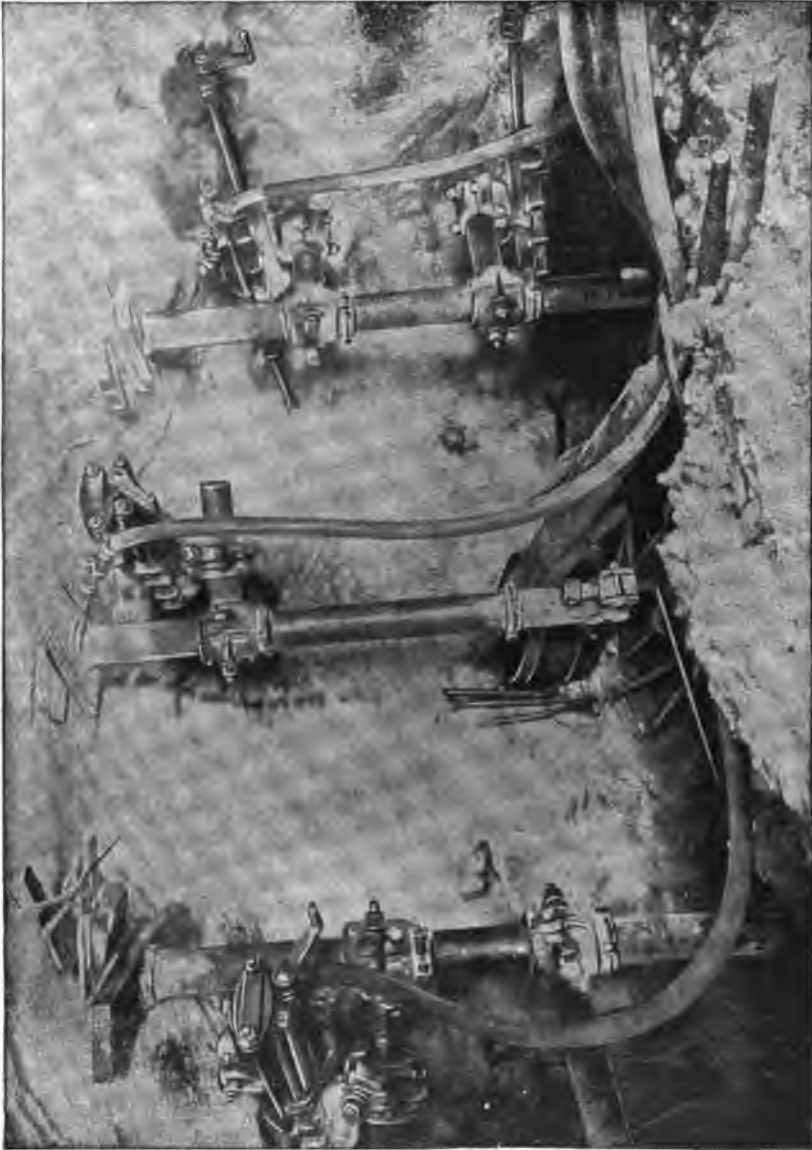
Mounting of Piston Drills on Columns in Tunnel Heading.
